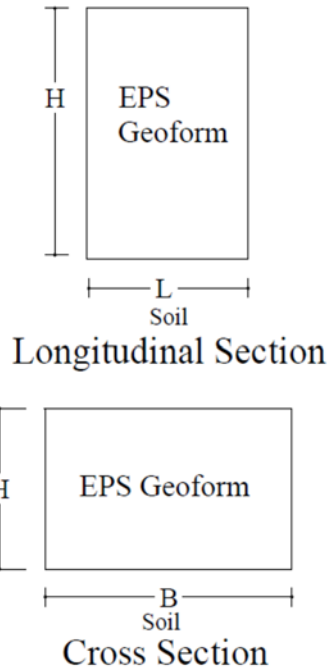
Longitudinal and cross section of rectangular prismatic shape EPS Embankment
